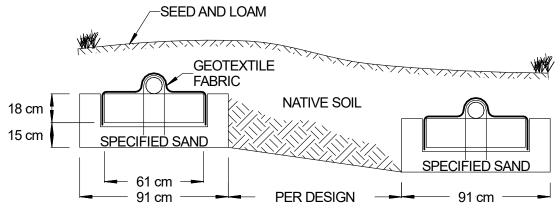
SECTION VIEW - TRENCH SYSTEM - SLOPING SITE
